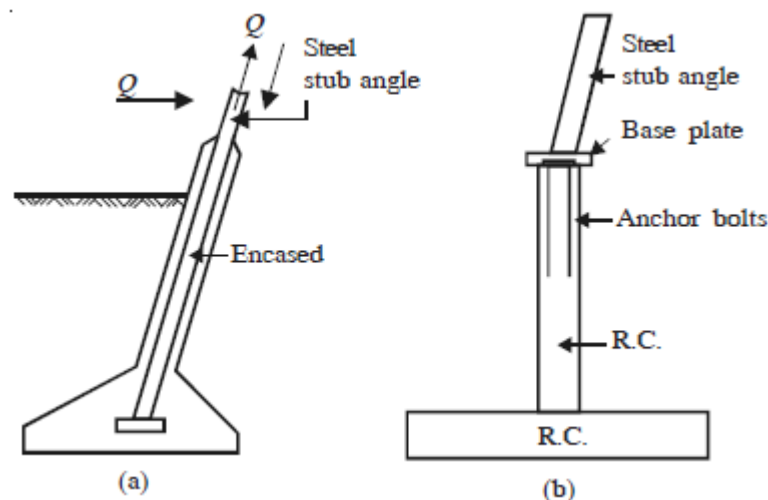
Types of steel tower foundations: (a) Chimney and pad footing; (b) R.C. footing.
